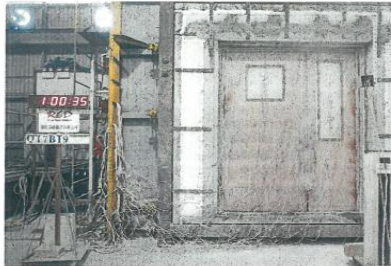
The unexposed face of the specimen after a heating period of 60 minutes.
